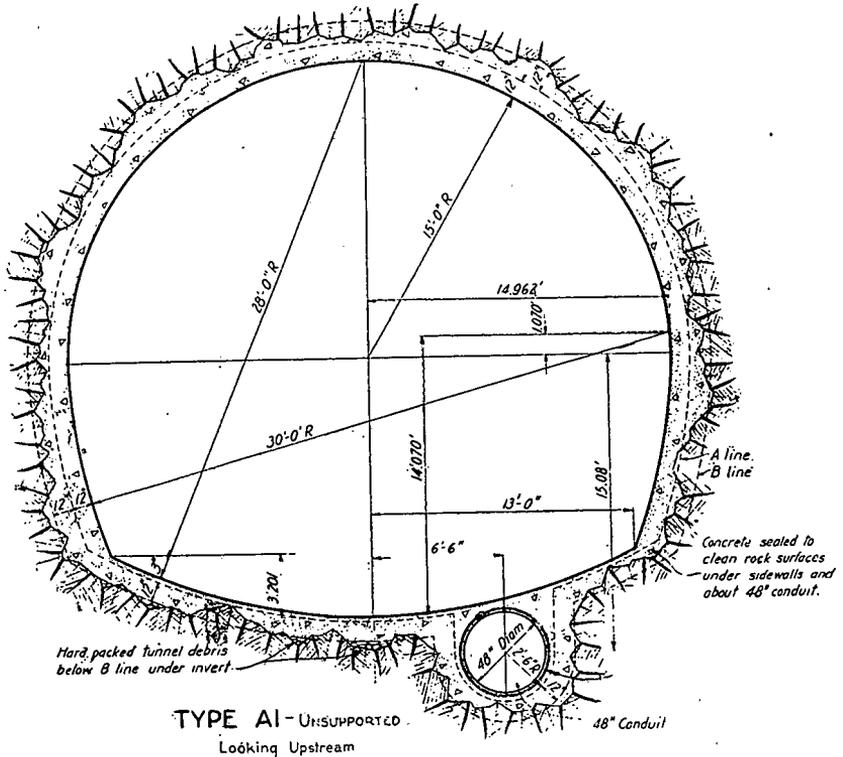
TYPICAL SECTION OF STREAM CONTROL TUNNEL
